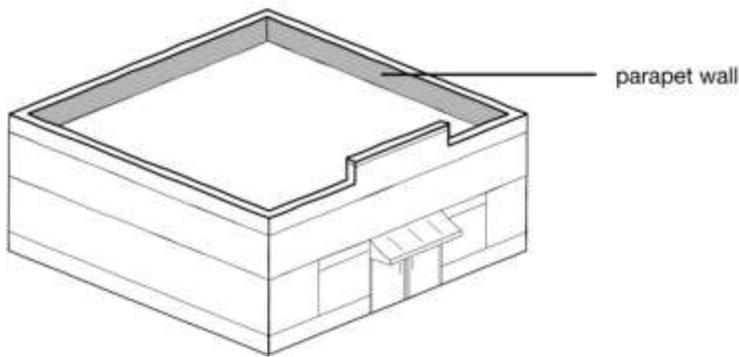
Terminology, Parapet or Parapet Wall
